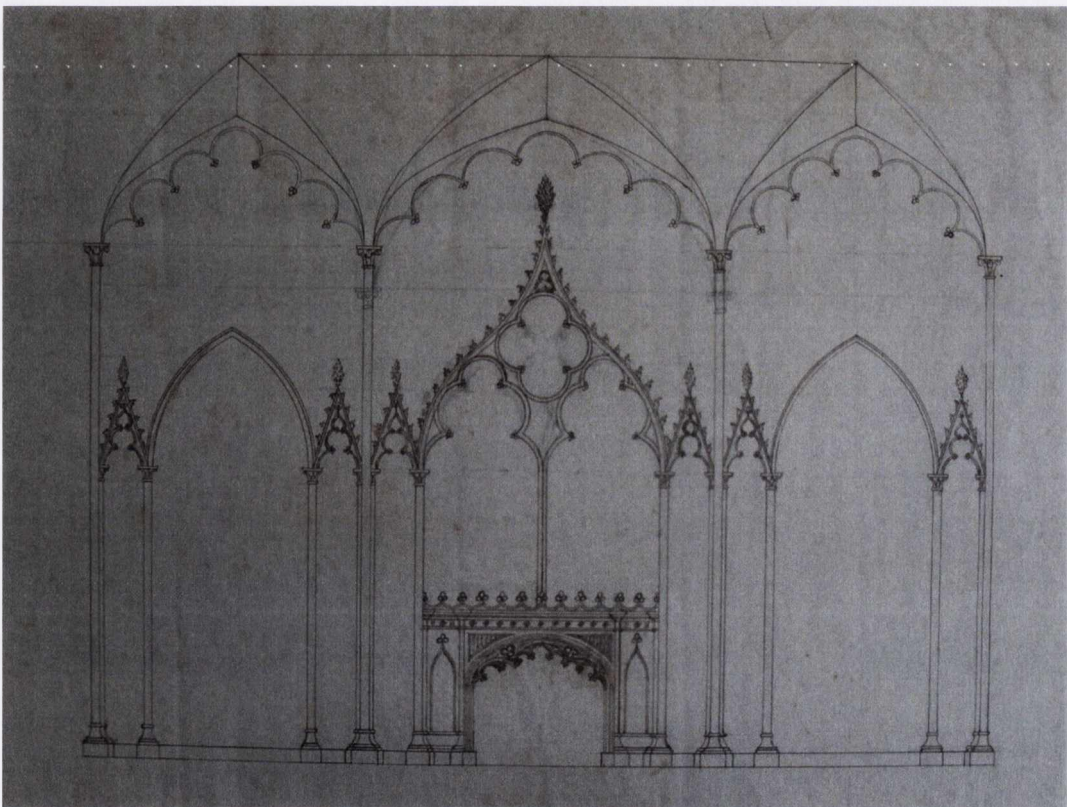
Birr Castle, proposed elevation for the fireplace wall in new drawing room, (unrealized), attrib. to John Johnston, [1804–1805], Rosse papers, O/18/4.
